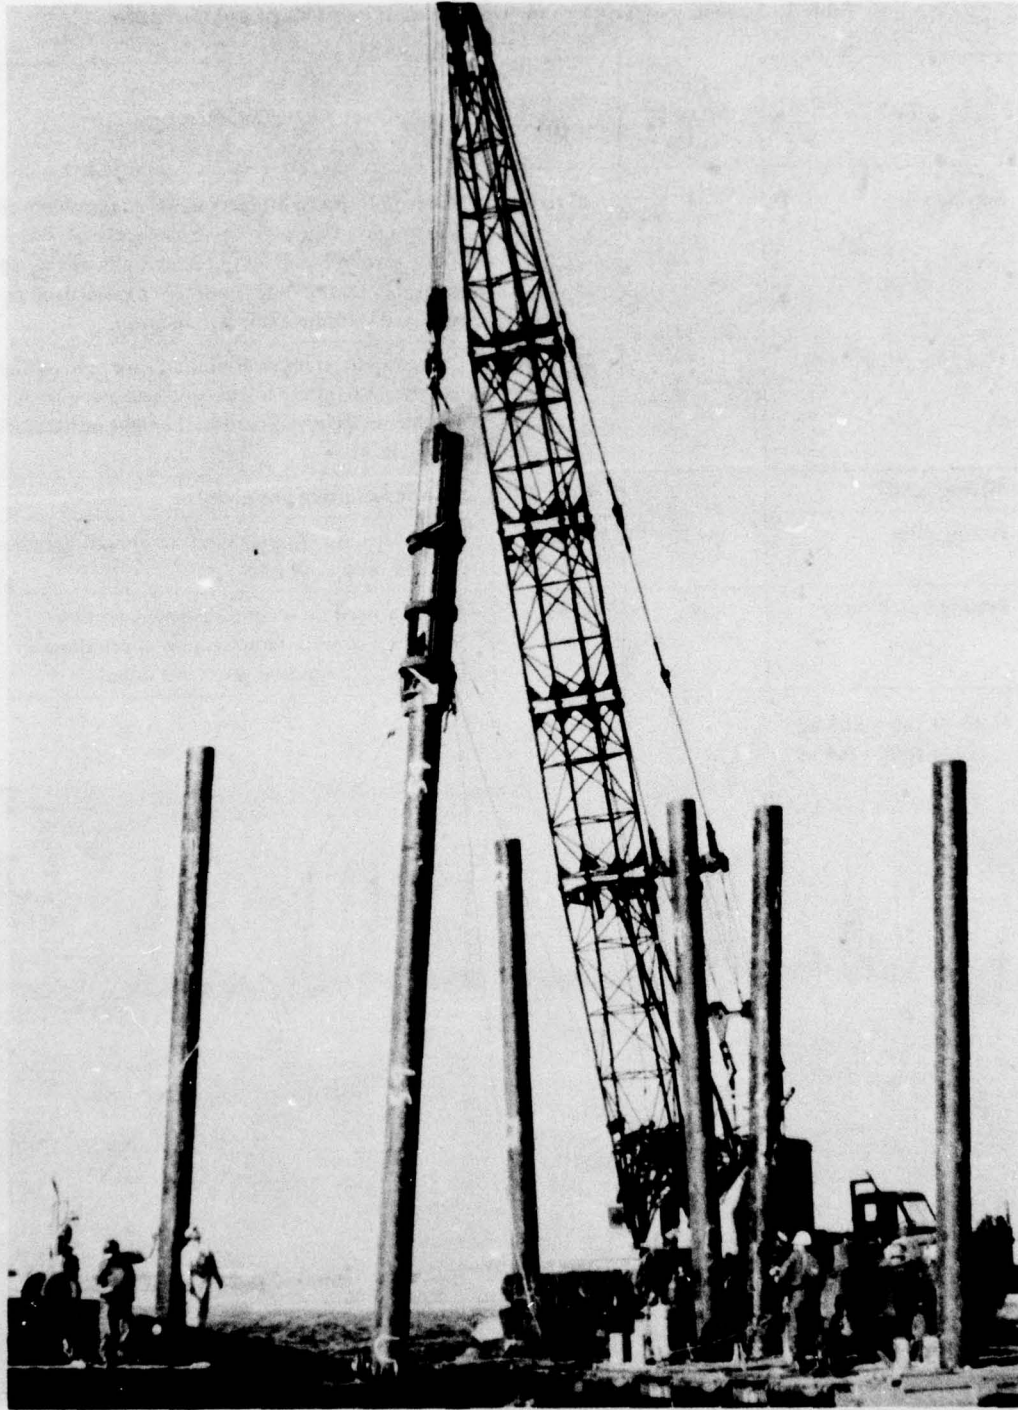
Driving steel pipe pile with DE-30 diesel hammer and truck crane.
